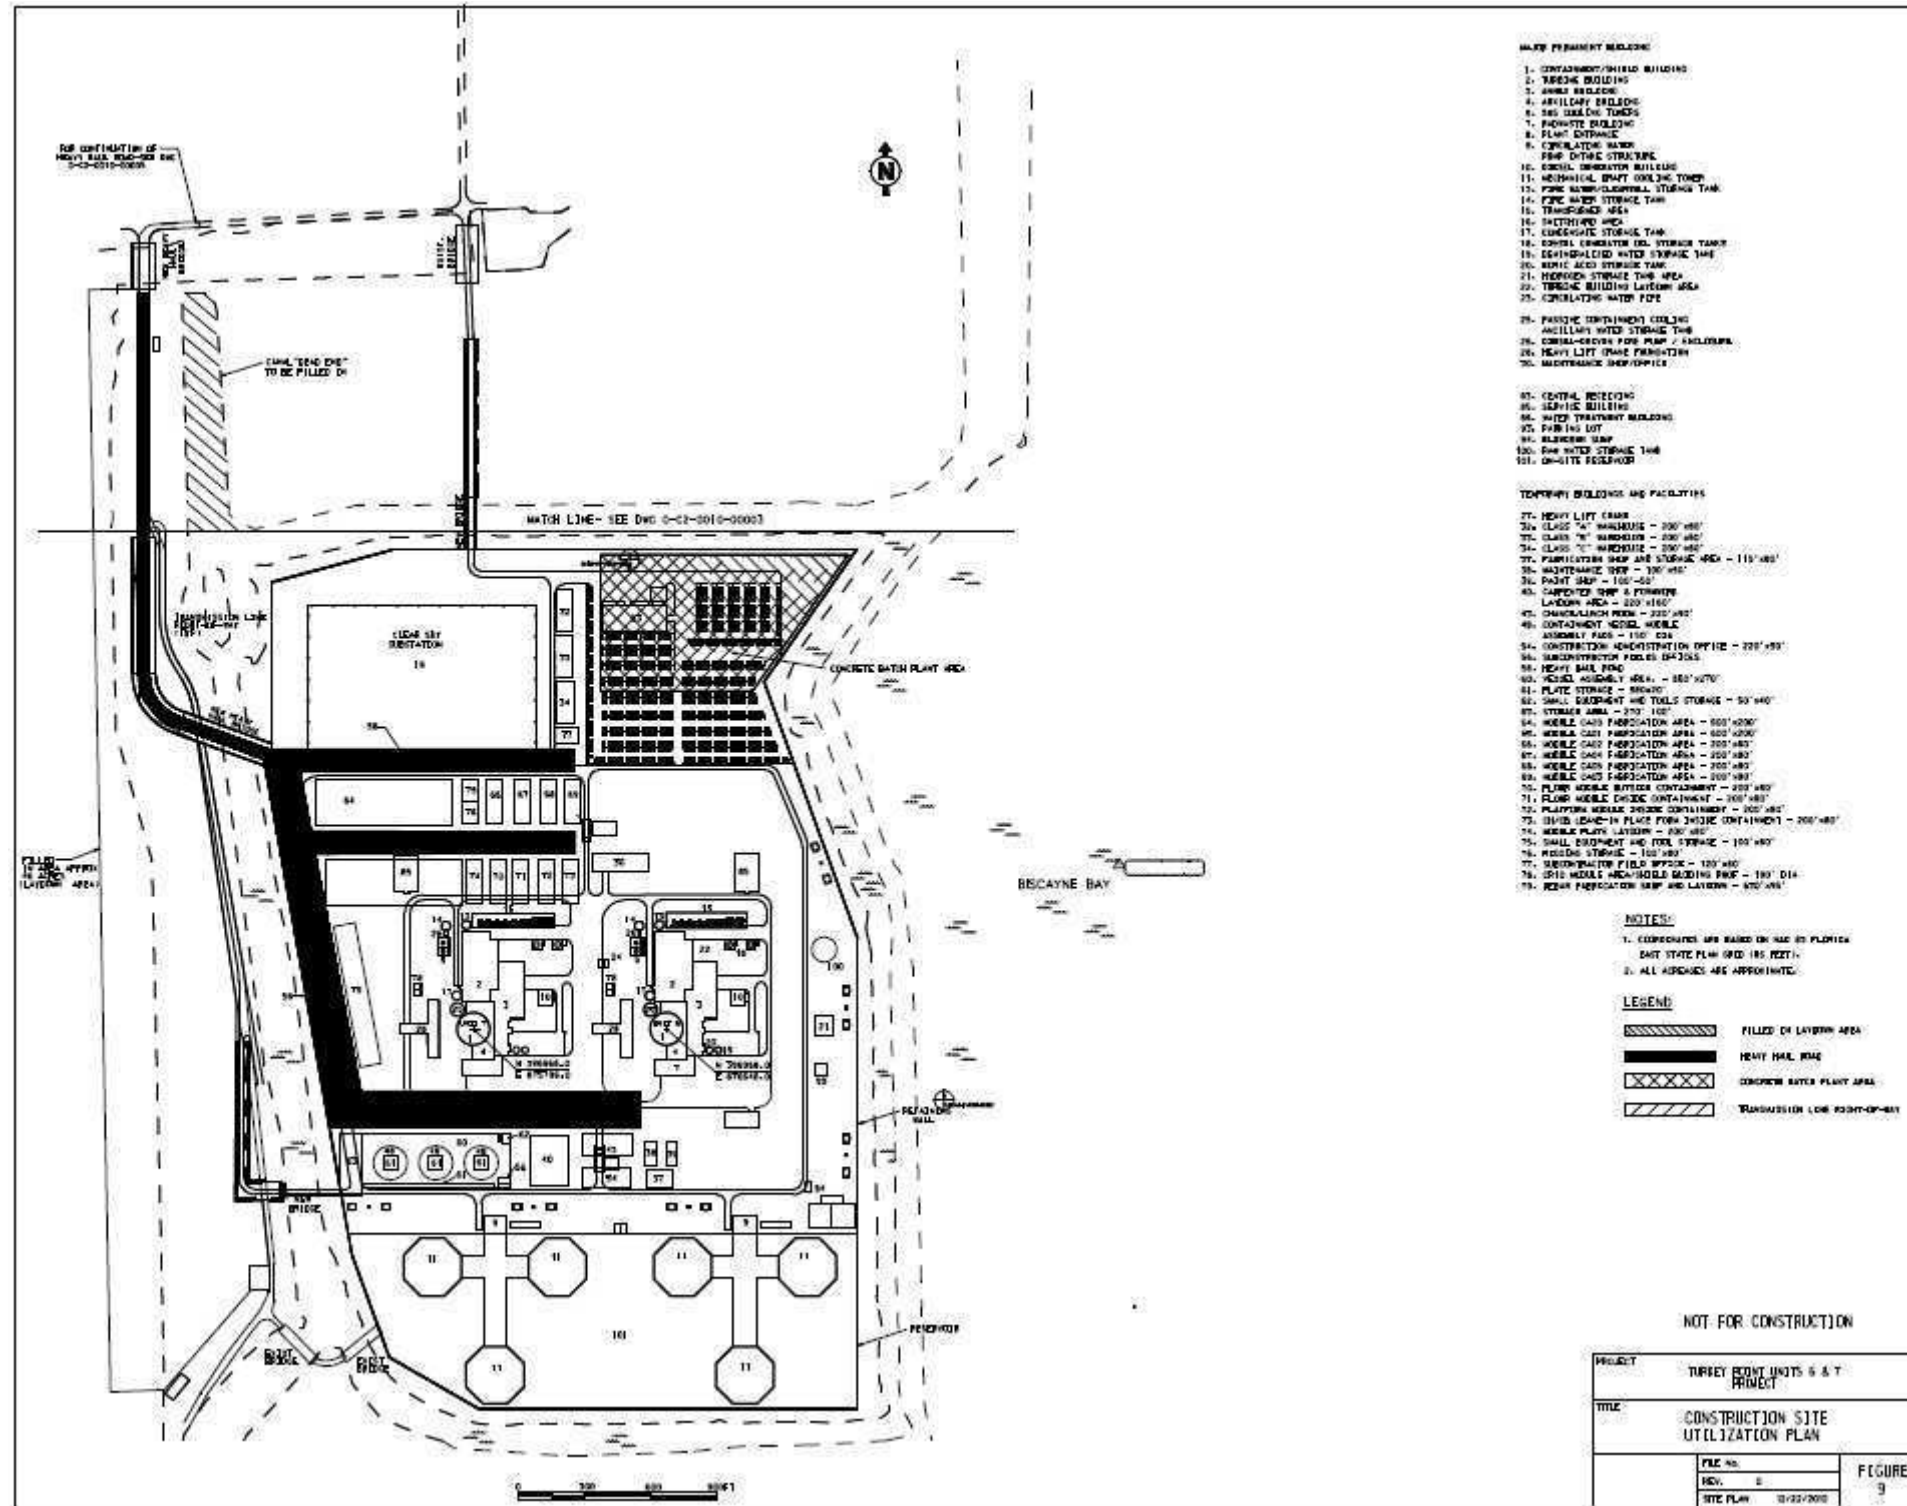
Turkey Point Unit 6 & 7 Construction Site Utilization Plan
